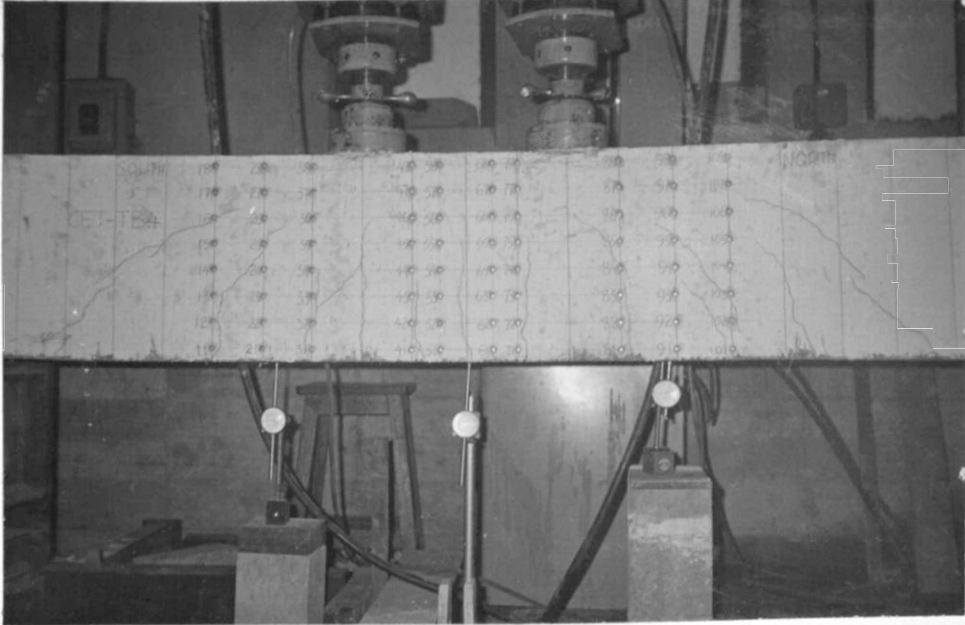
Beam CFT-TB4 at about 3/4 Capacity
